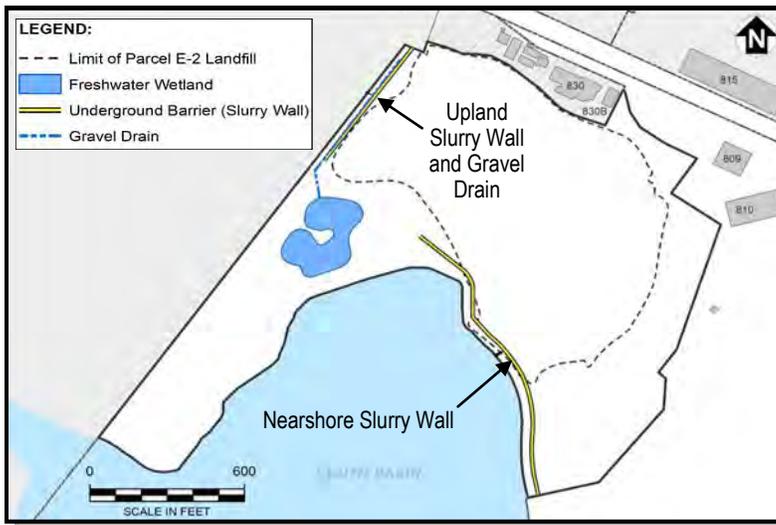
Locations of Underground Slurry Walls at Parcel E-2
